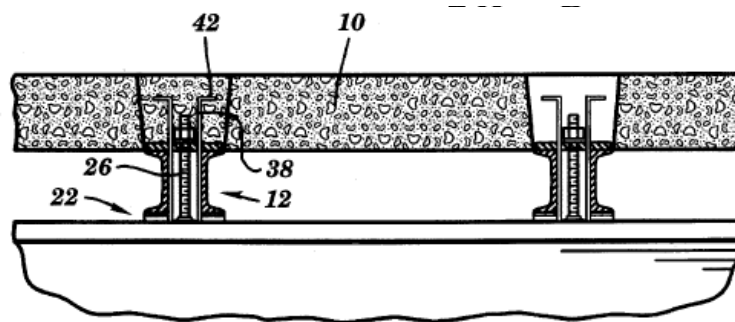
Final Installation Cross-Section (Smith 1997)
